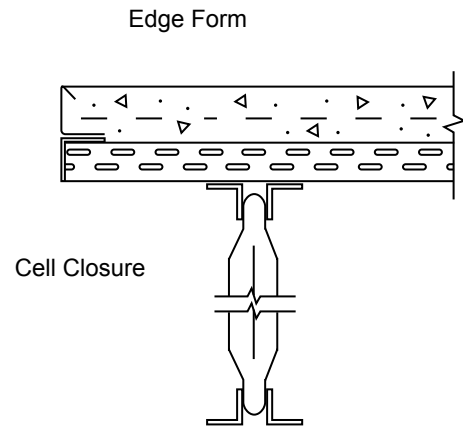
CONCRETE OR CMU WALL LEGER DECK PARALLEL
